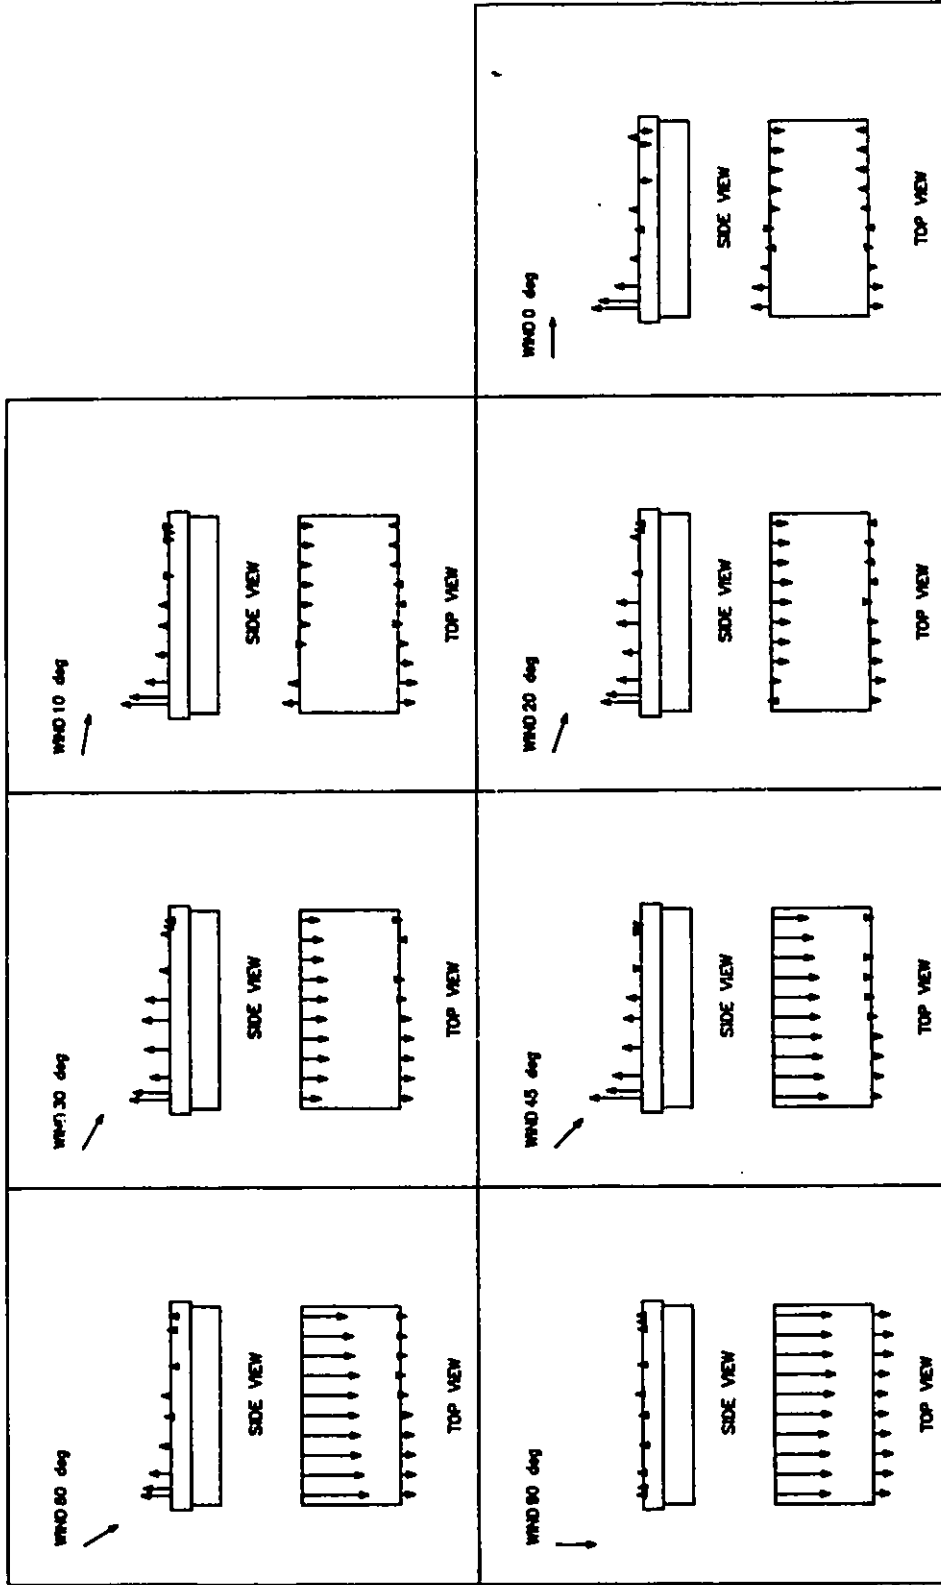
Δ Cps (in-out), open model, simulated 400 mm ridge and 800 mm sidewall openings, closed end walls, wind angles = 90°, 60°, 45°, 30°, 20°, 10° and 0°.
